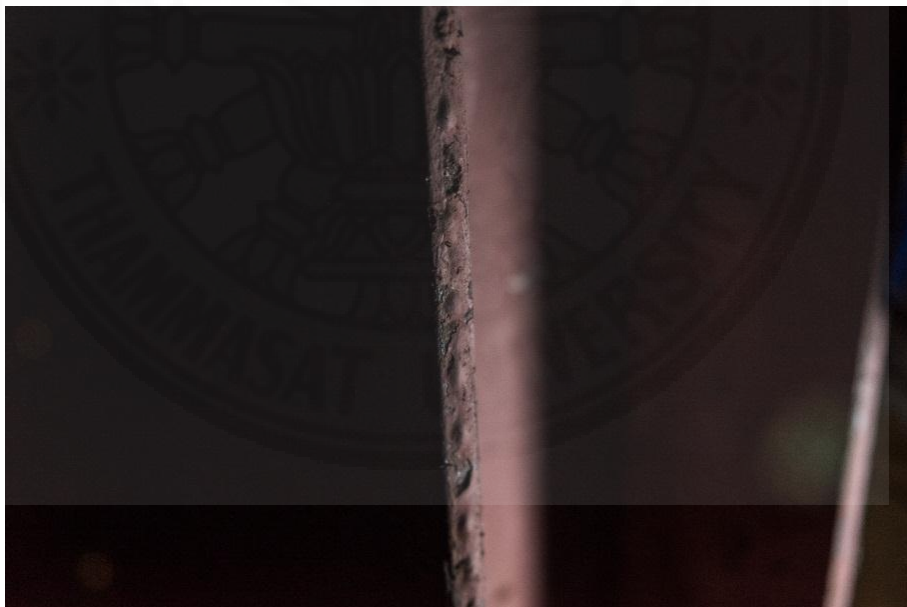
Blistering of paint on steel column at Roof Structure A
